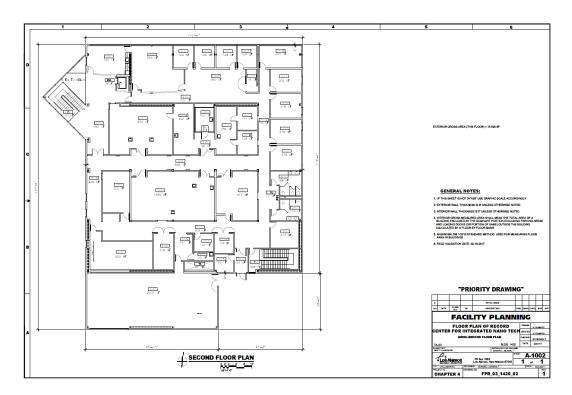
TA-03-1420 (CINT) Second Floor Plan
